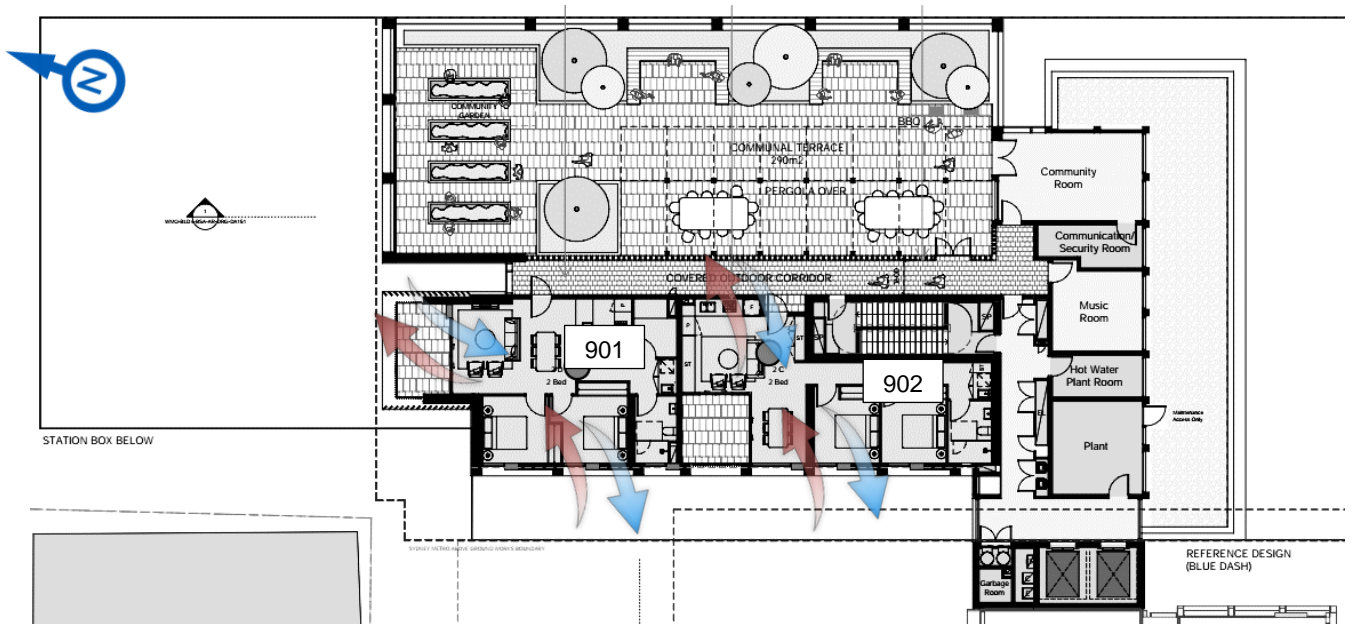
Natural Cross Ventilation Floor Plan – Level 2
